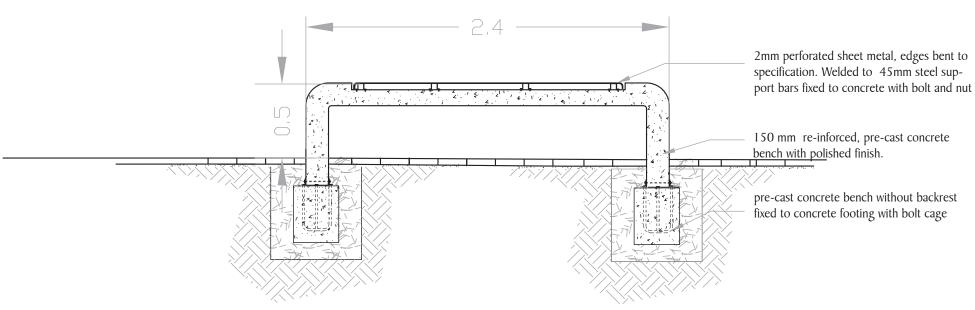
Bench without backrest Part elevation. Scale 1:25 (Author, 2008)
